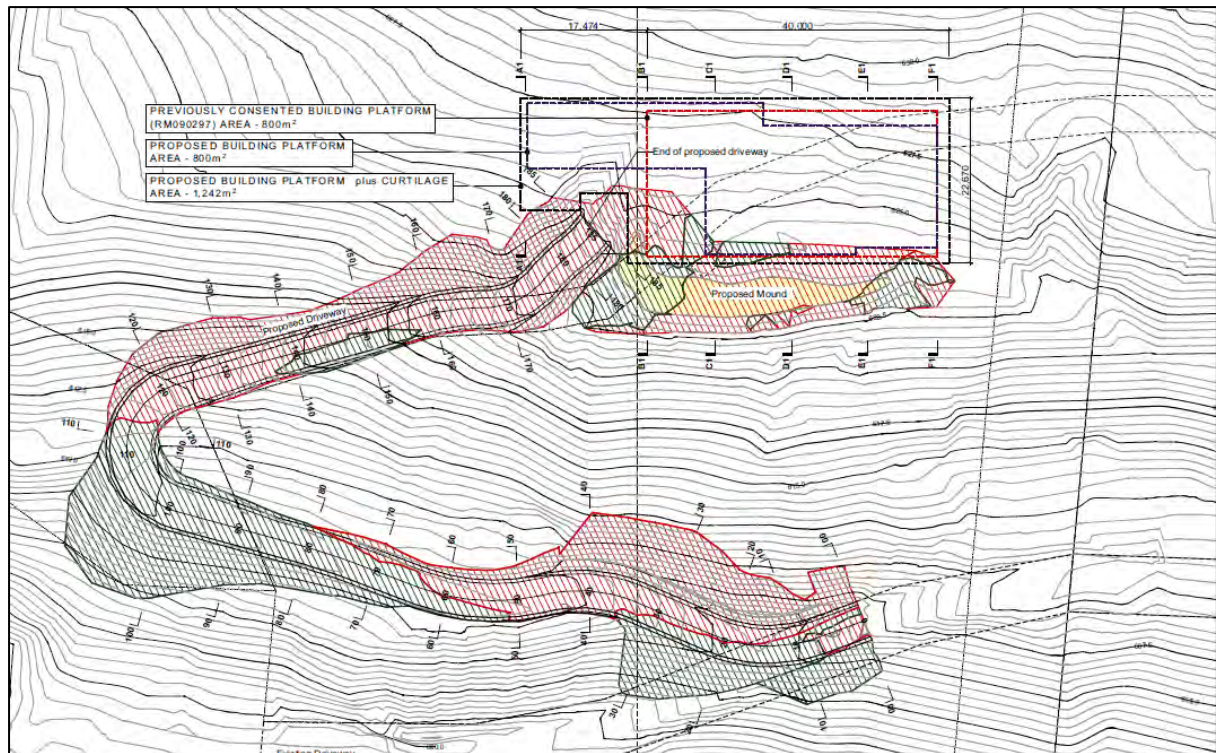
Site plan showing proposed building platform (in blue), building platform approved under RM090297 (in red) and indicative outline of building footprint.
